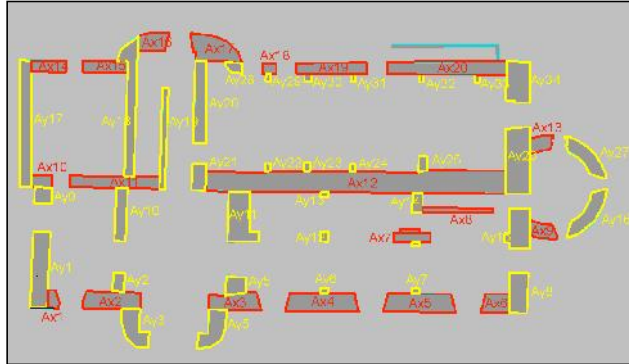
Identified masonry elements for Level 1 along X and Y direction.
